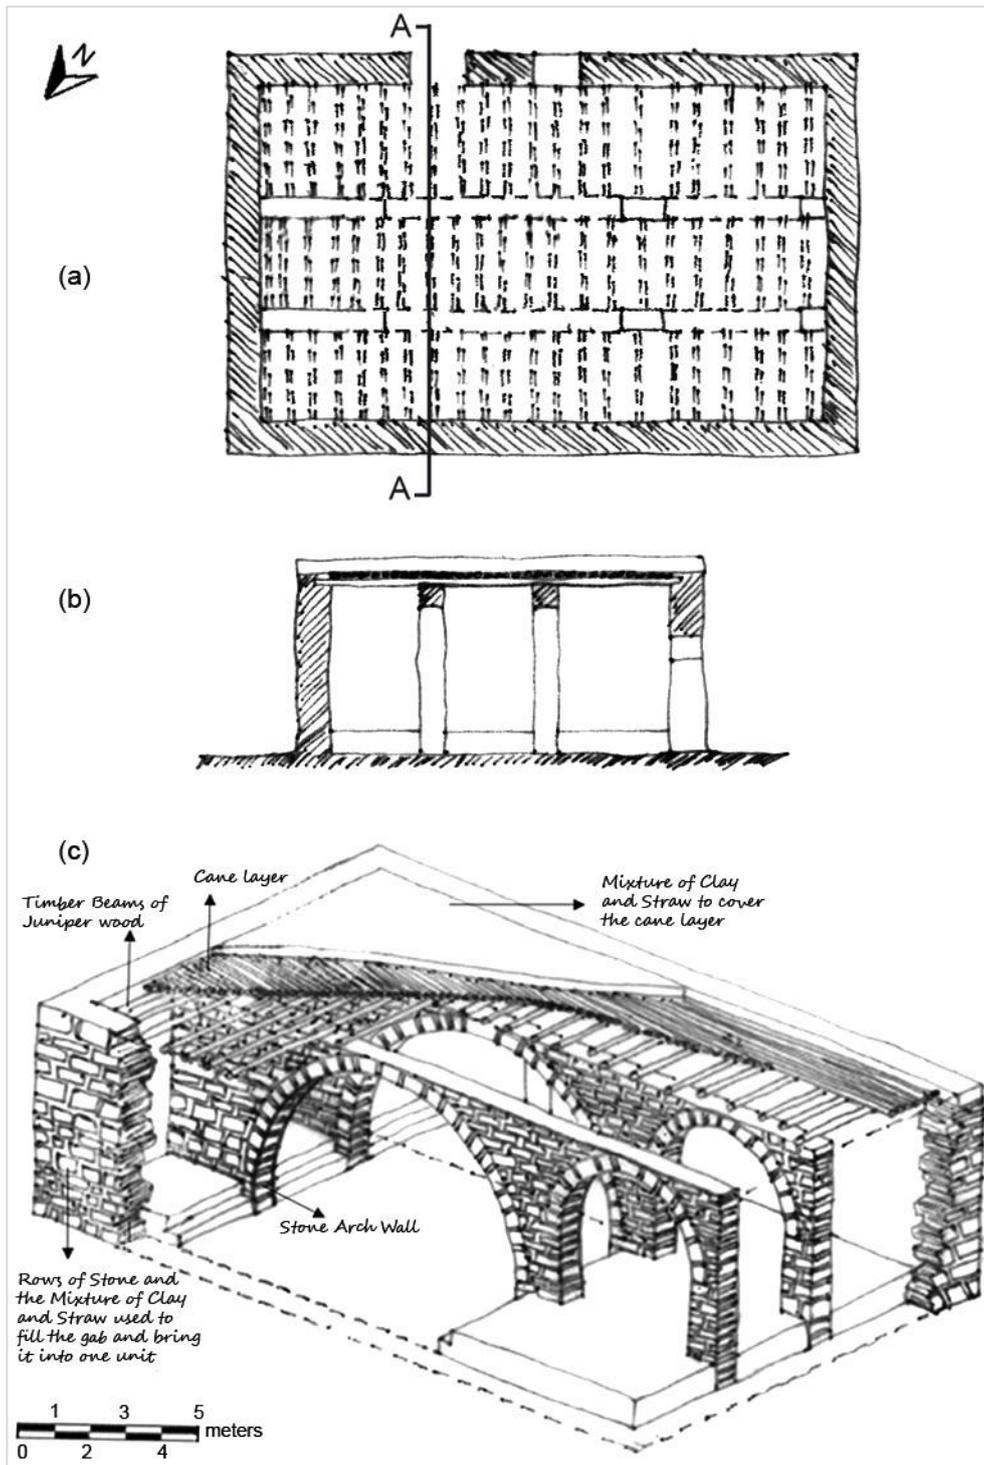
House B, an example of the simple single-space house type: (a) plan; (b) section; (c) axonometric (Author 2019)
